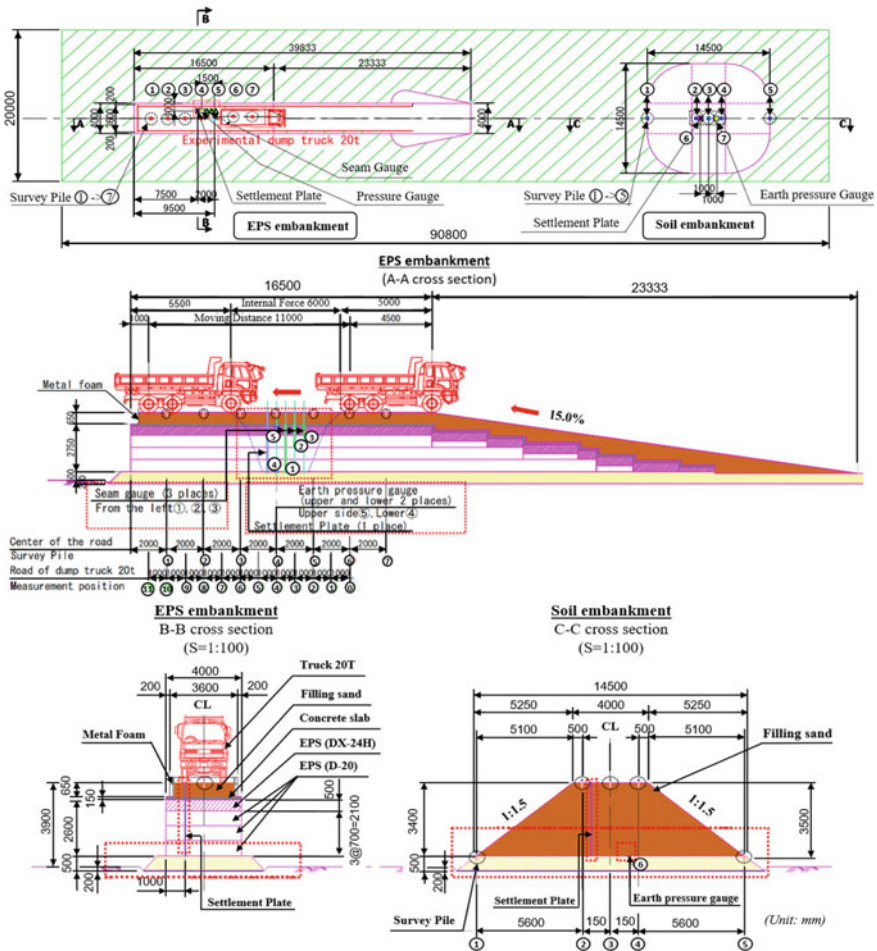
Layout of the full-scale embankment test with monitoring devices
